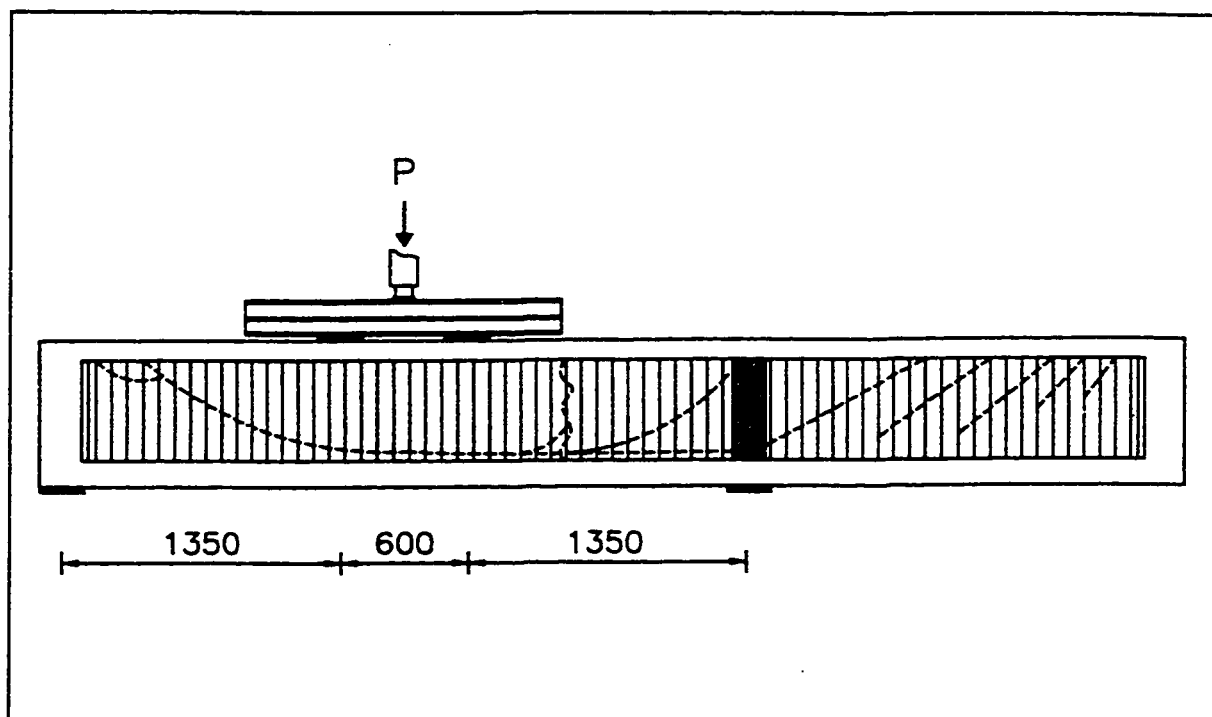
Web buckling pattern at the end of testing, girder A-80-b
